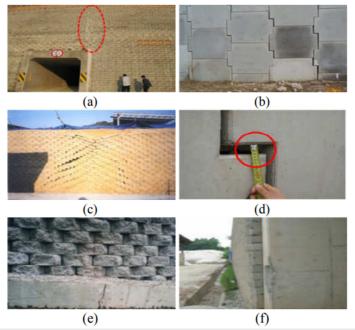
Excessive settlement and deformation (a) cracking of facing wall, (b) differential settlement of facing wall, (c) settlement of REW, (d) excessive settlement of facing wall, (e) differential settlement of REW, (f) deformation of wall) (Lee and Cho, 2011)
